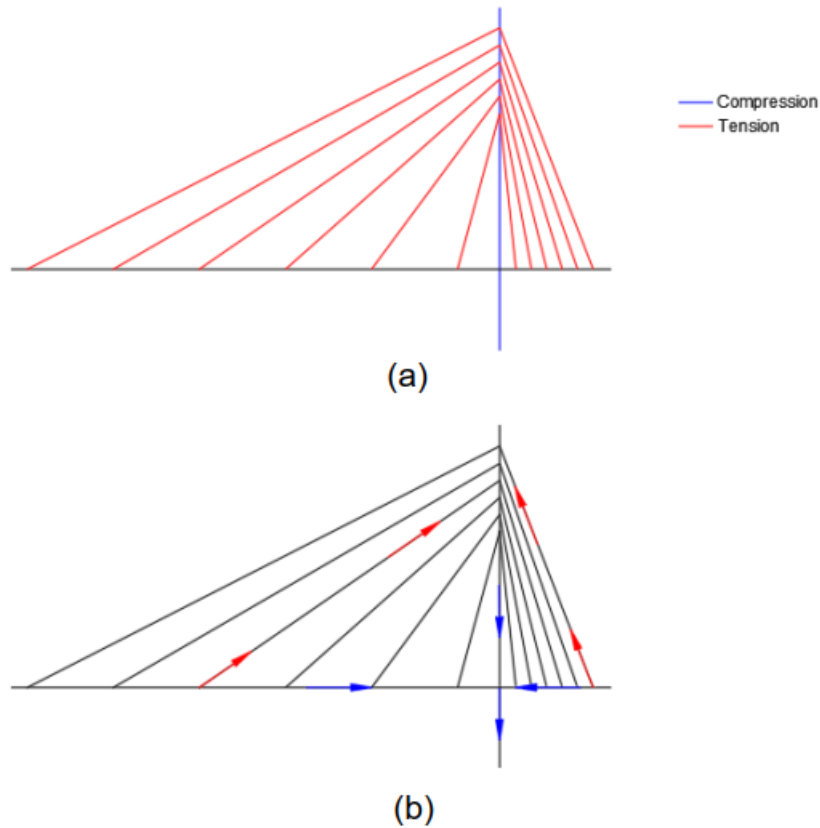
(a) Stresses diagram of Cable-stayed Swing bridge (b) Load Paths of Cable-stayed Swing Bridge (not at scale)
